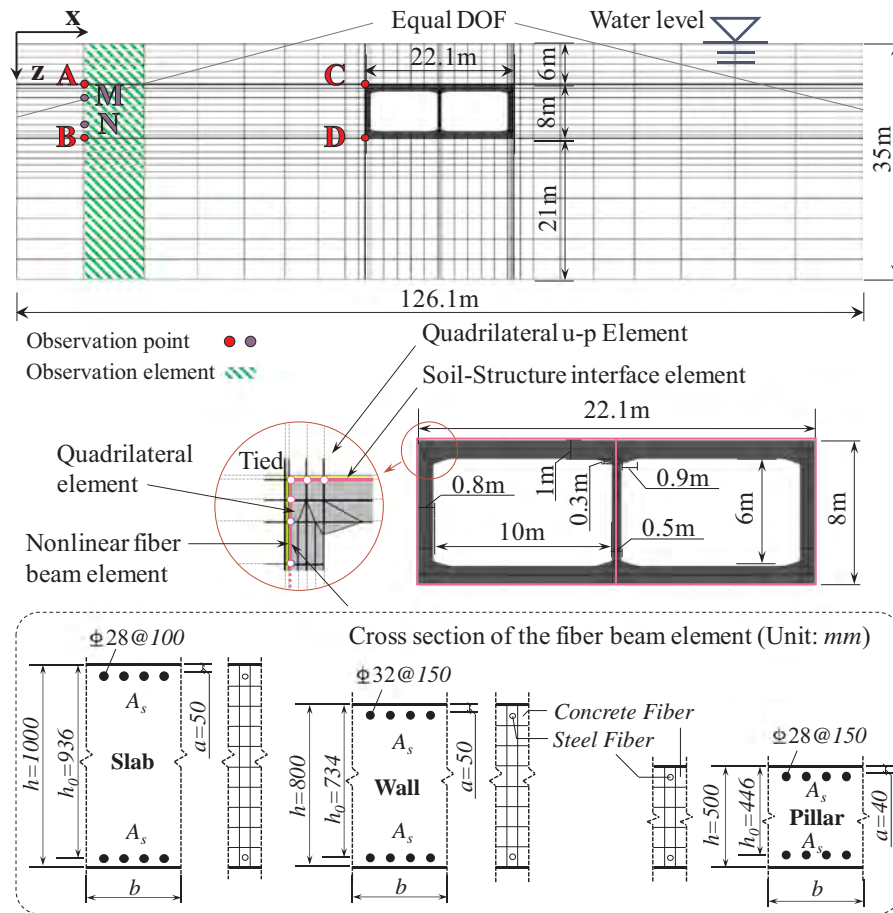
Geometry of the numerical model; spatial discretizations; locations of the control points A-D, M, and N; and structural details of the underground reinforced concrete structure.
